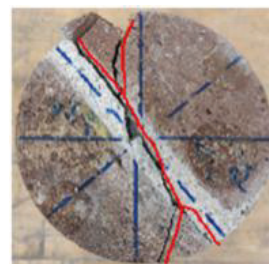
Tensile failure of brick in splitting test on masonry core [Li & Esposito [7]]
